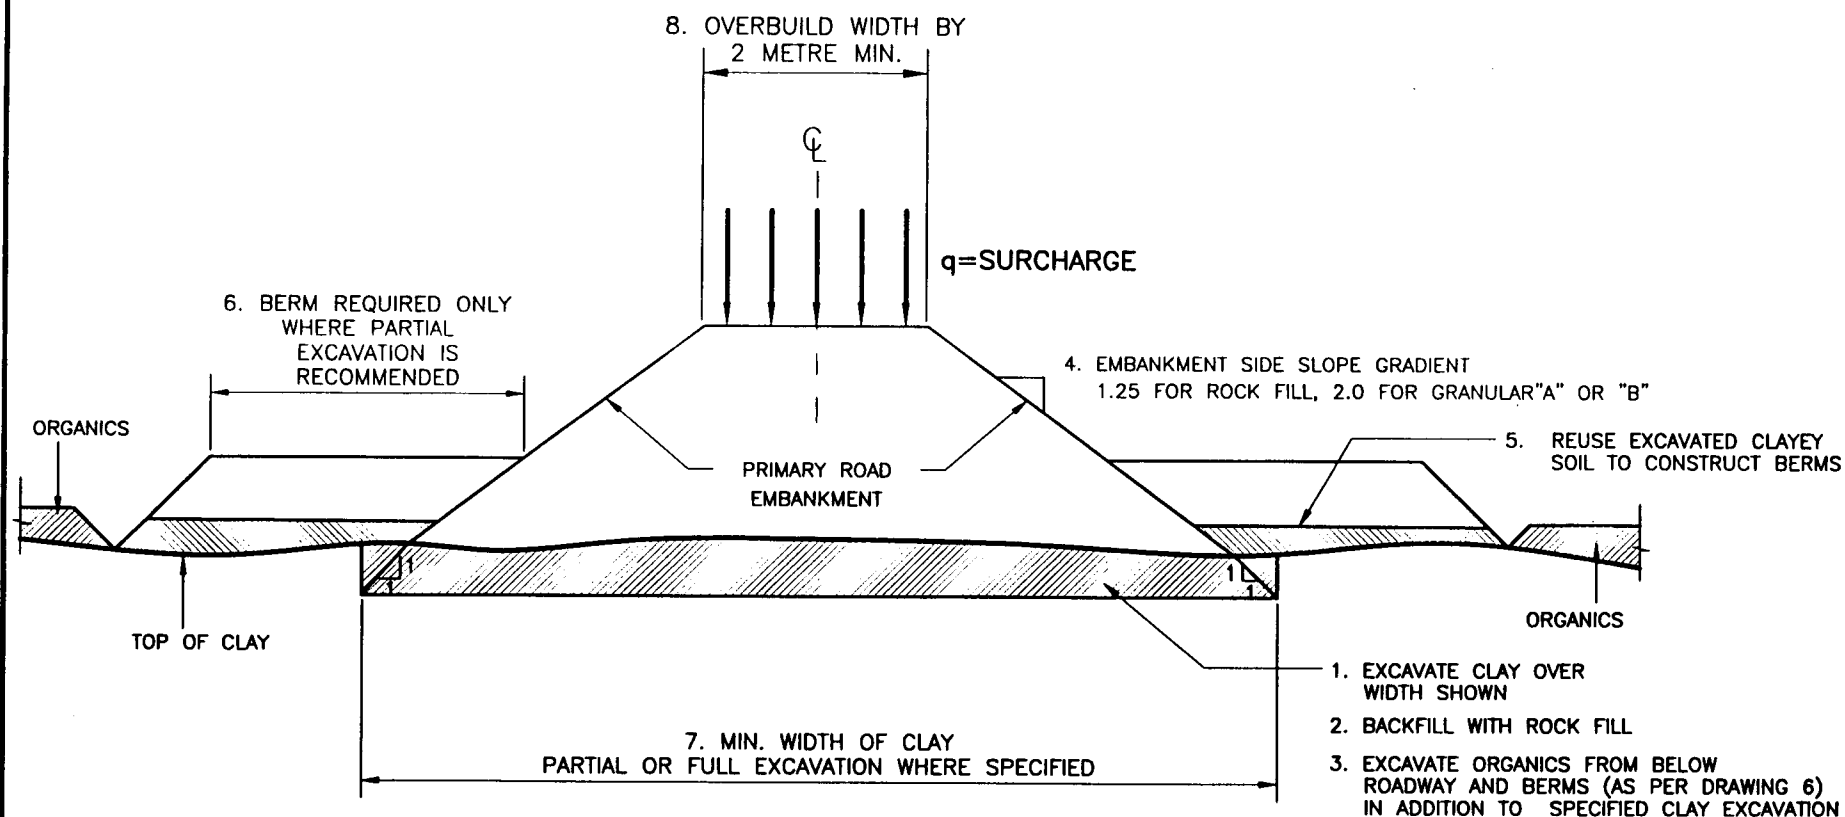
ROAD EMBANKMENT GEOMETRY— PARTIAL OR FULL EXCAVATION OF CLAYEY SOIL STATIONS 21+720 TO 21+810, HIGHWAY 69.
